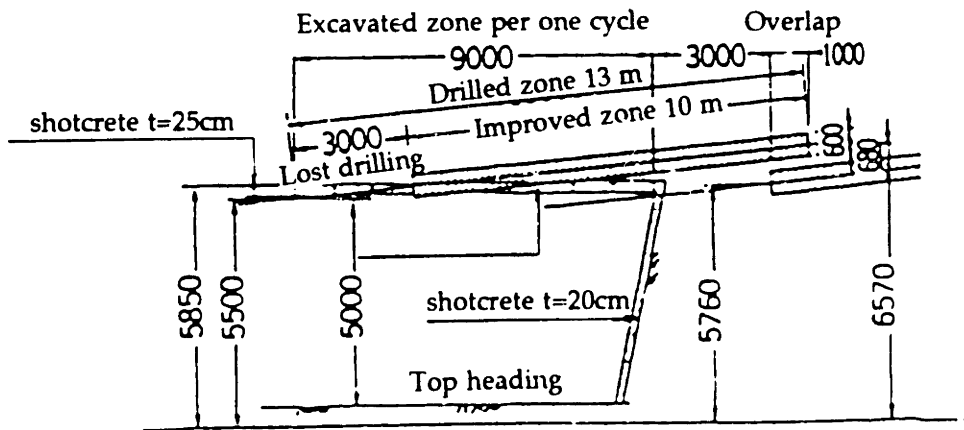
Cross and longitudinal sections: Aziro Tunnel (Shimizu et al., 1994)
